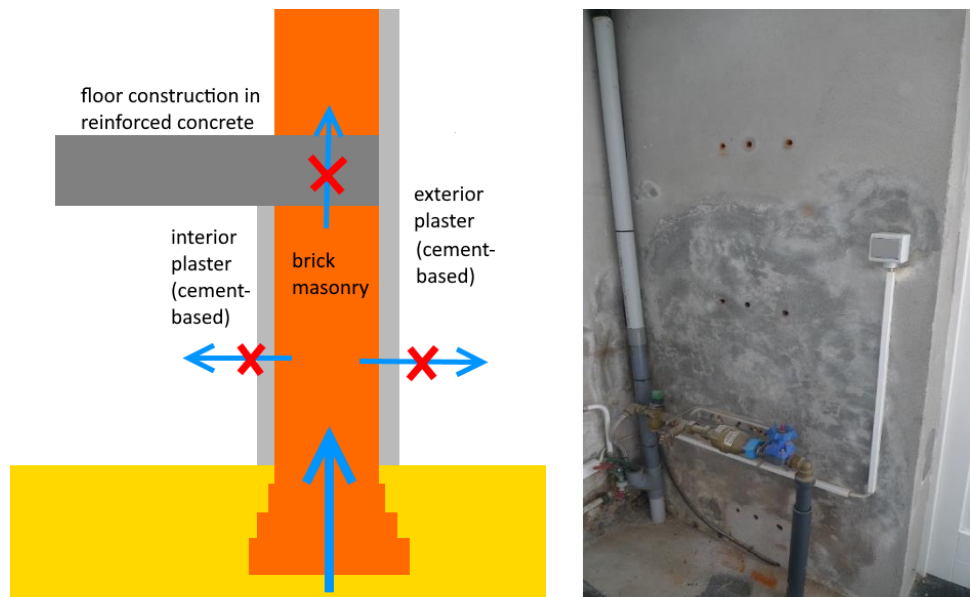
structure of the walls of the ground floor. The presence of the plasters with low capillarity and low water vapour permeability, and the concrete floor, cause the humidity to be trapped in the masonry on the ground floor.
